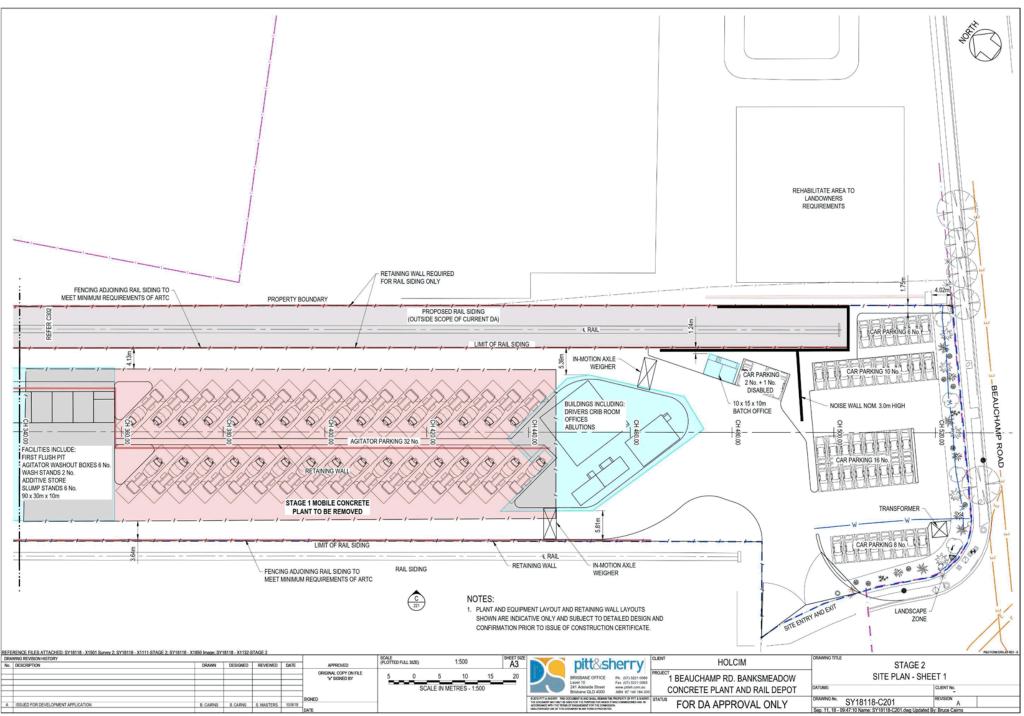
Stage 2/3 Concept Layout – Sheet 1 (Subject to Detailed Design)
